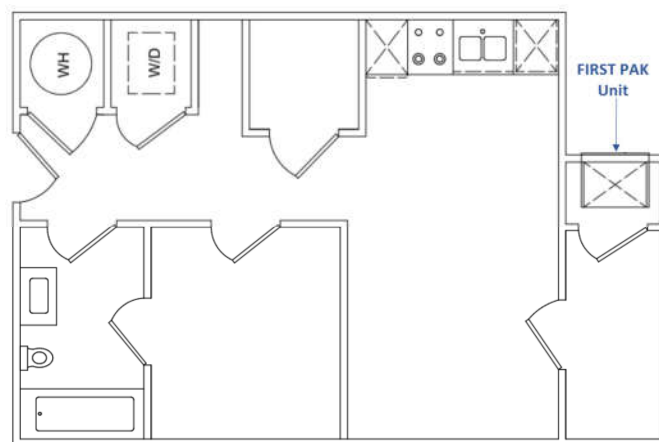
Typical Floorplan with FIRST-PAK on Exterior Wall
